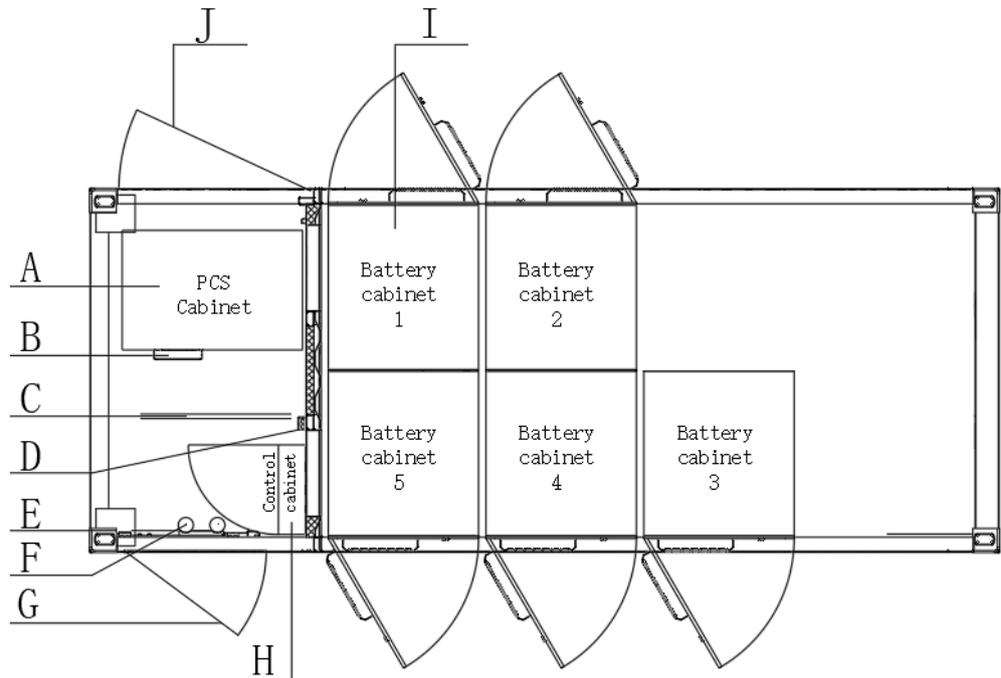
Floor plan for PowerMount-P600-1290kWh (top view)
